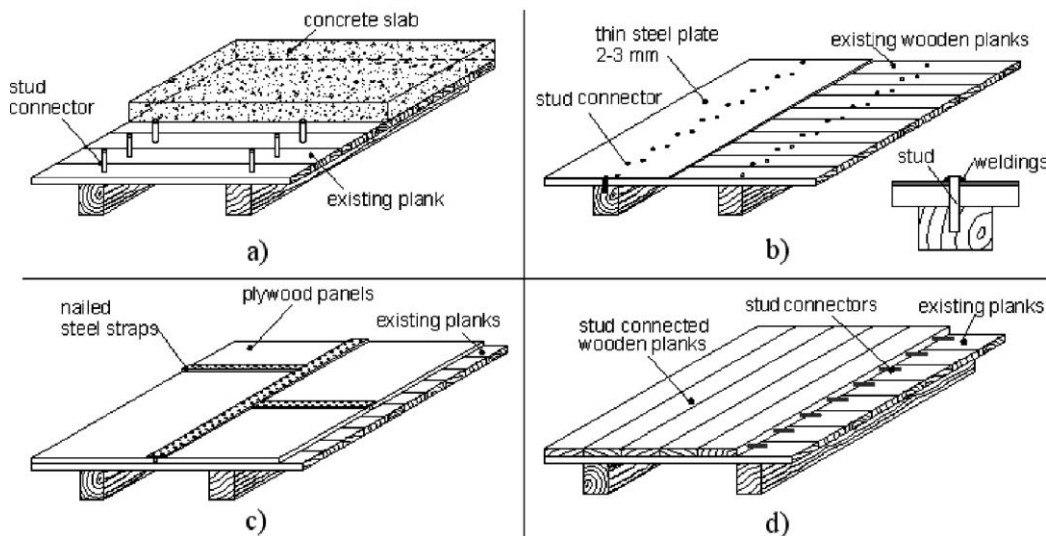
Schematic illustration of strengthening wooden roofs by means of overlaying: (a) thin ordinary concrete slab; (b) thin steel plate; (c) nailed plywood panels; and (d) stud connected wooden planks ⁽¹⁹⁾.
